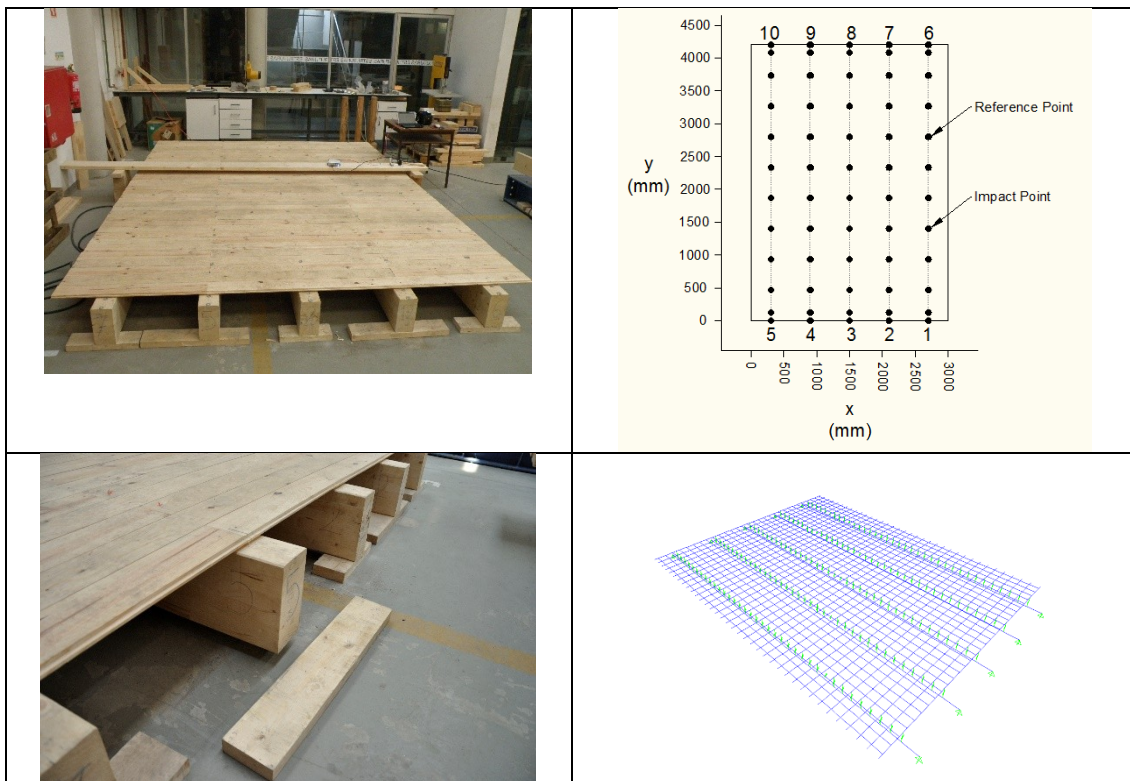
a) Timber floor; b) Test layout; c) Remove of support in test; d) Finite Element model of the floor.
